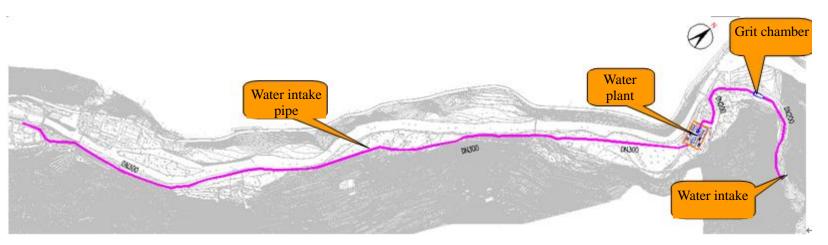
General layout plan of Lianghekou Water Plant in Baoxing County
